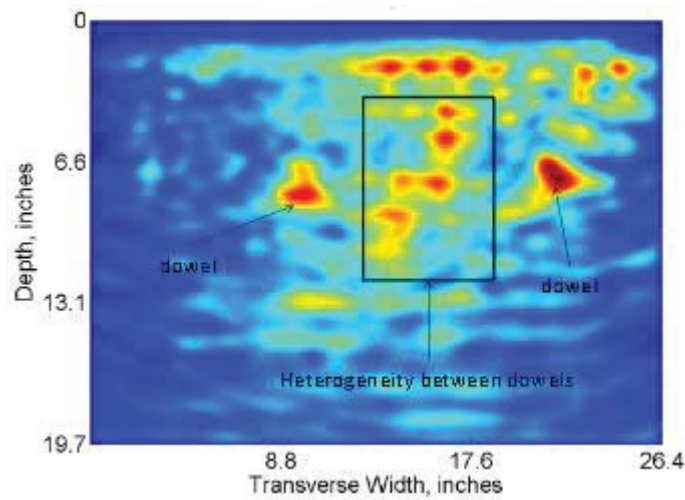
MIRA B-scan of a section of two-lift concrete pavement indicating poor consolidation. 1 in. = 25.4 mm (Hoegh et al. 2015).
